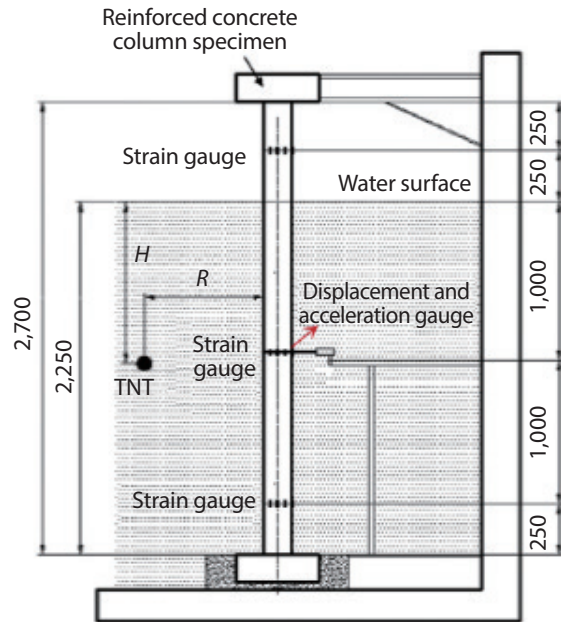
Sketch of arrangement of test towards Reinforced Concrete (RC) column.
